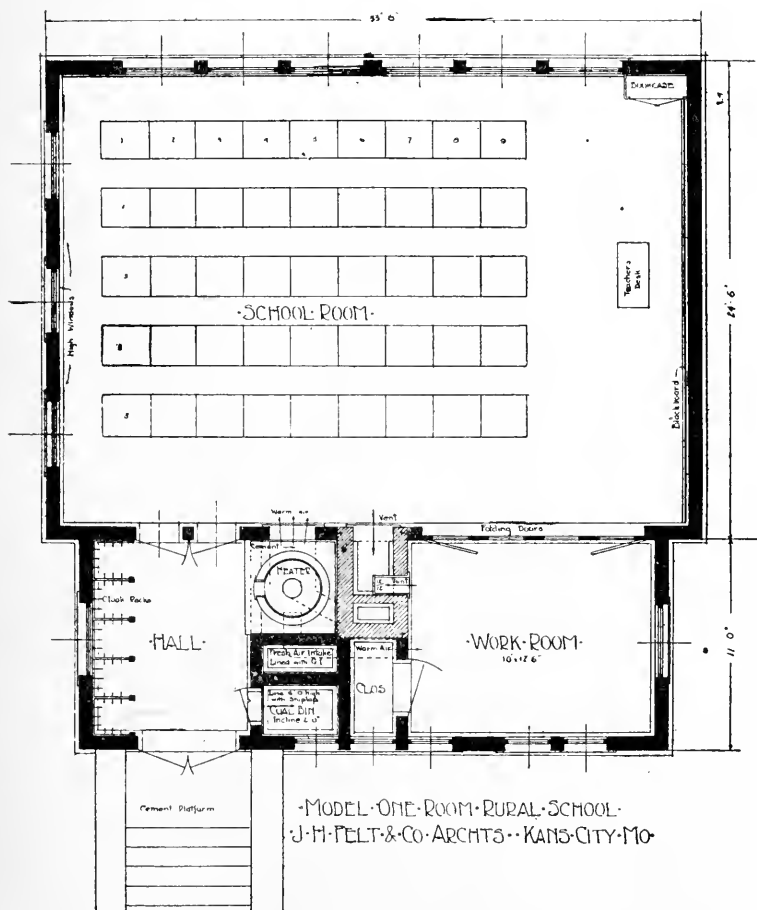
Plate I shows the perspective and Plate II the floor plan of a one-room rural school. These plans show the essential features of a modern school building.
